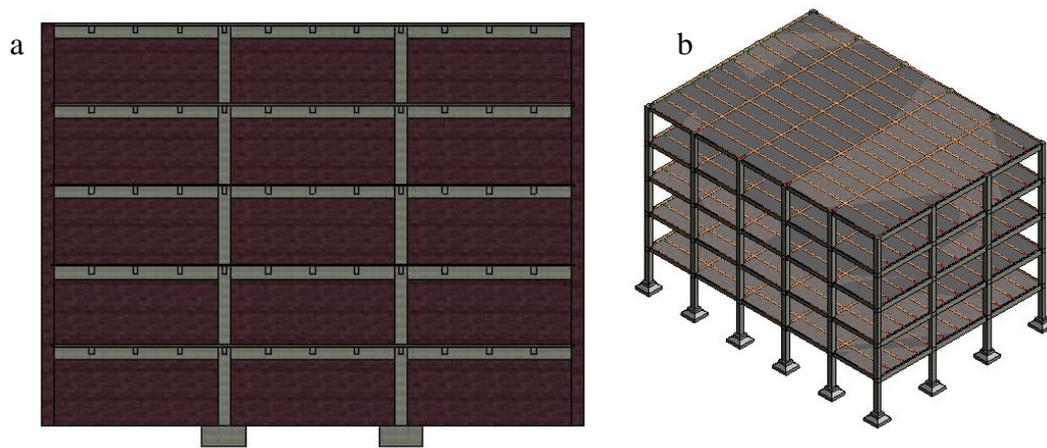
Physical model of a reinforced concrete frame in Autodesk Revit: (a) - architectural pattern; (b) template of the load-bearing structure.
